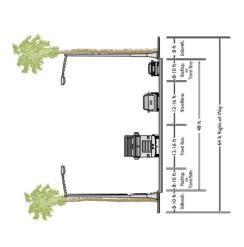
(20F4): CITY OF REDLANDS GENERAL PLAN ROADWAY CROSS-SECTIONS
